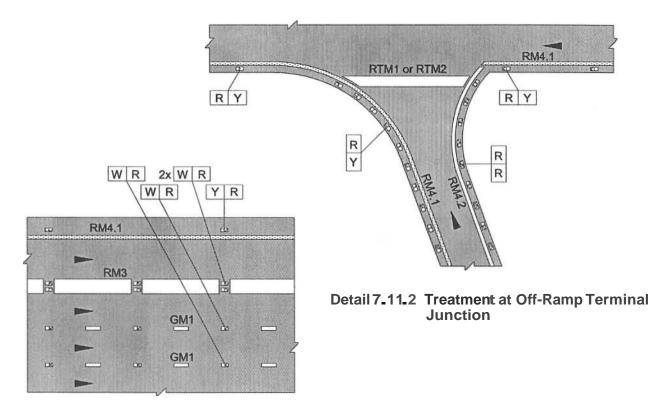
Typical Roadstud Use on Freeway Carriageways
